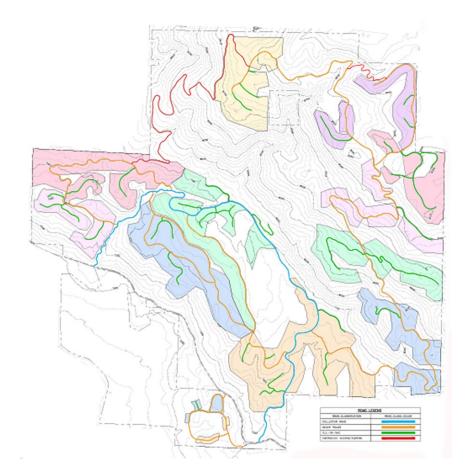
Road Classifications Plan (large format version located in Appendix L)
